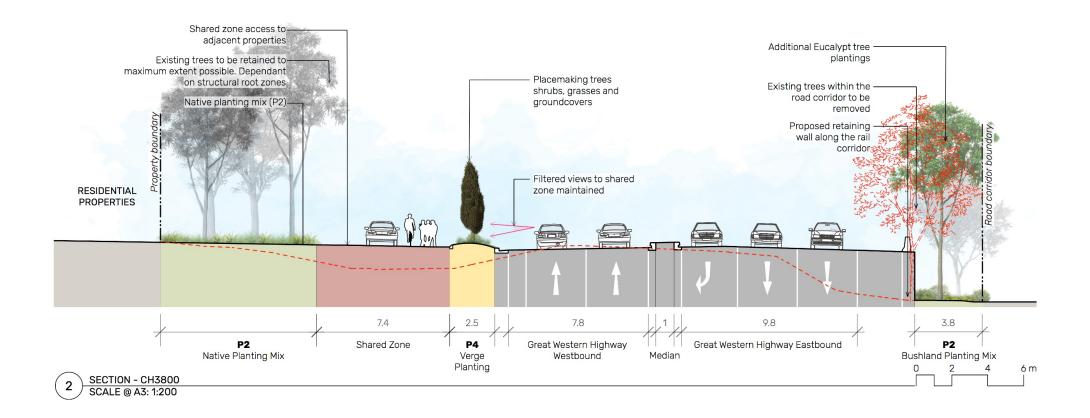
Typical cross section within southern portion of proposal – north of Bellevue Crescent showing shared zone and right hand turn lane (SMM, 2021)
